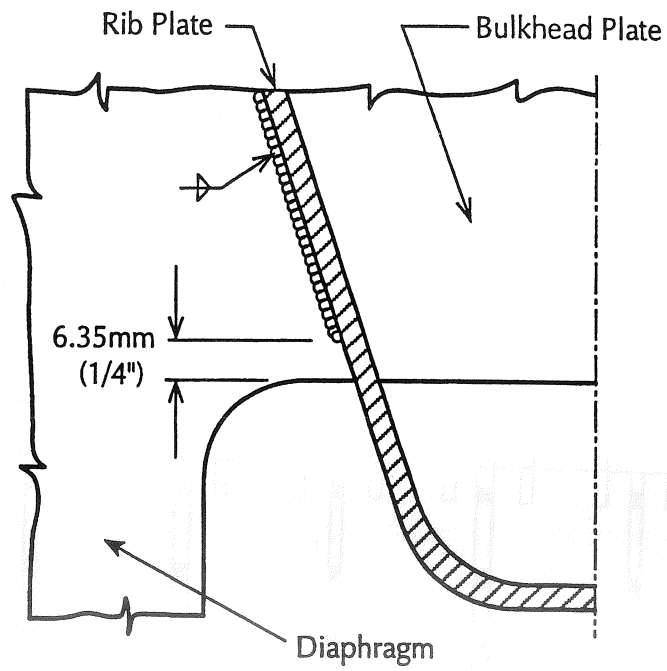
Weld Option B for Rib to Diaphragm Connection
